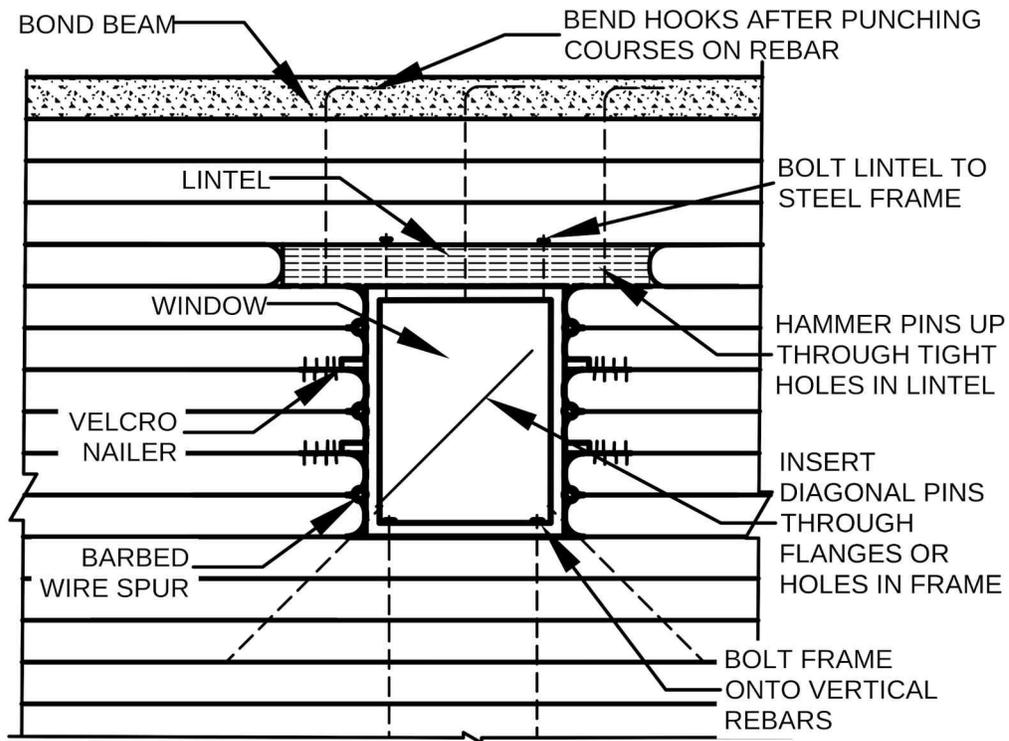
Welded steel frame connected to lower and upper rebars use velcro nailers and rebar spurs to connect into wall material on both sides.
